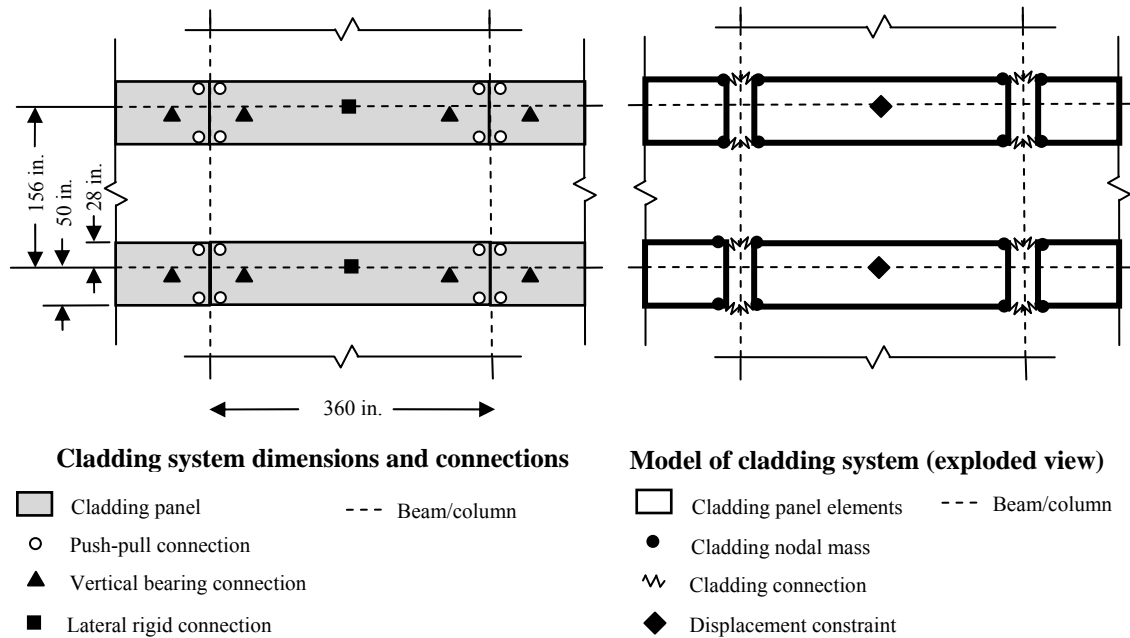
Detailed elevation of Model C1: (left) view showing connection types, (right) model view
